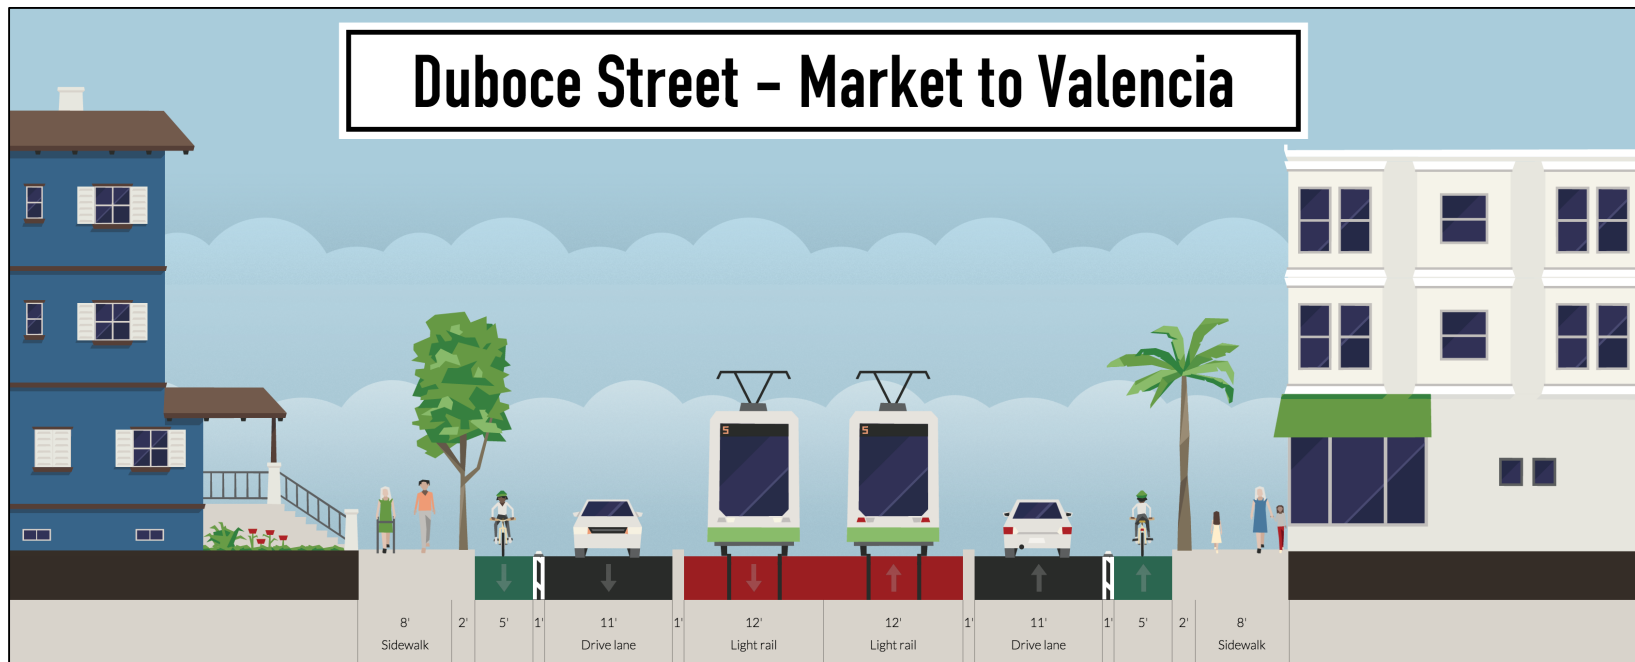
Duboce Street cross section. Duboce Street between Market and Valencia would not be reconstructed as a boulevard, but it would be reconfigured with streetcar tracks, bike lanes and reduced traffic volumes.
